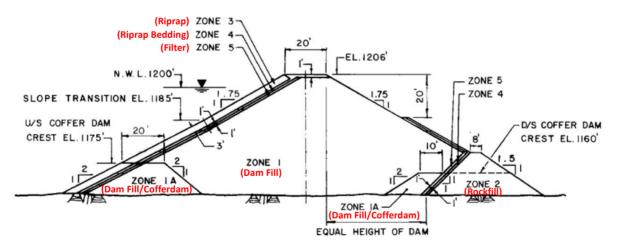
Typical Design Cross-Sections of Dam D-9 on Bedrock (Surveyer, Nenniger & Chenevert Inc, 1976).
